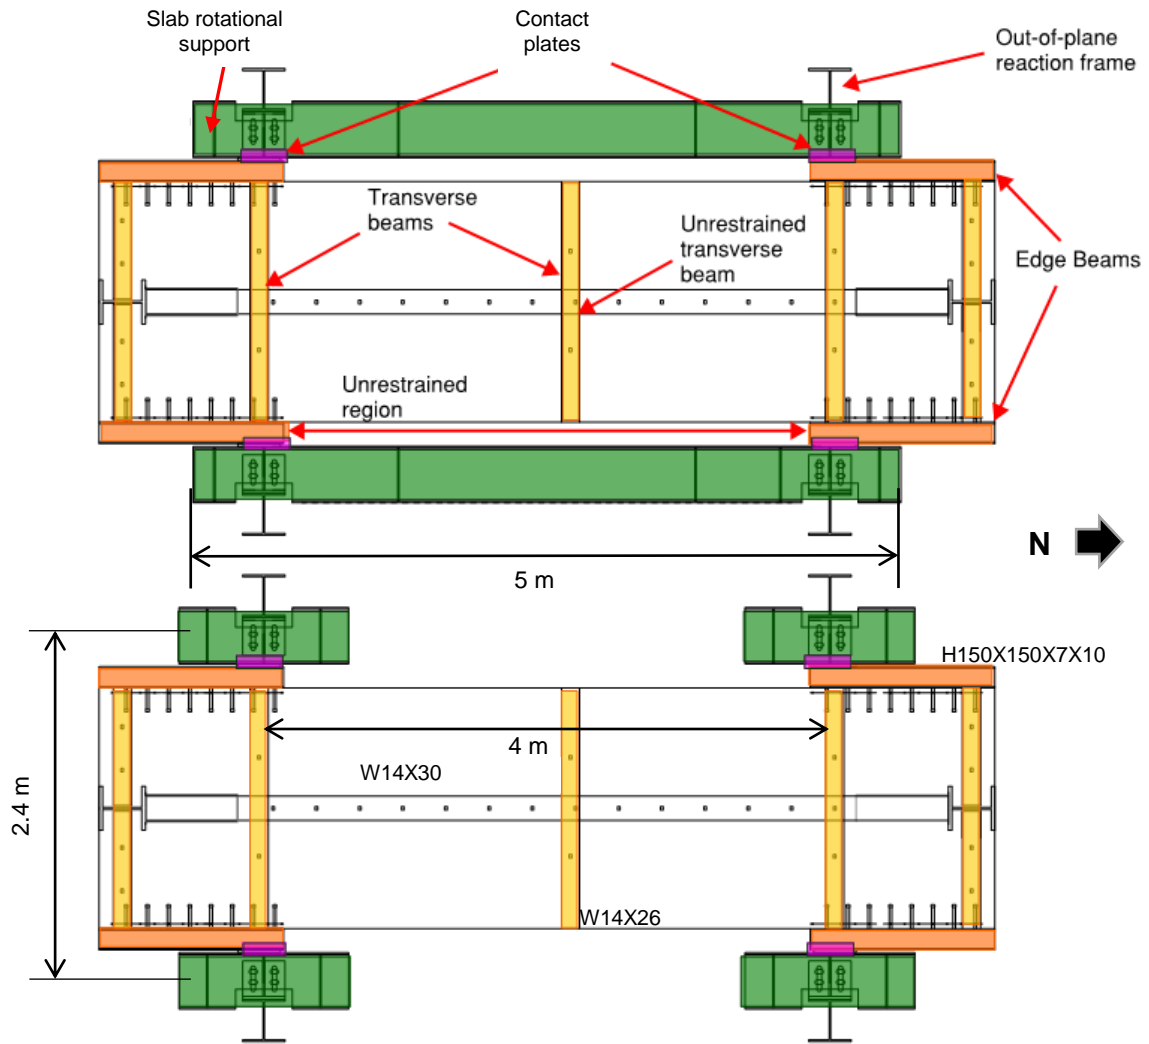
Typical floor and ceiling plan of the test setup at lower beams
